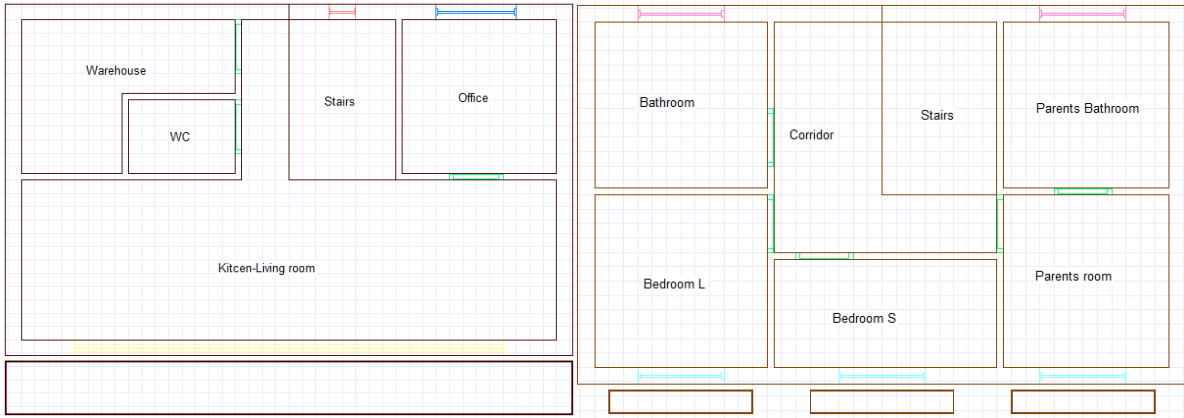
Plans (ground floor and upper floor) of the building (North direction is upwards).
